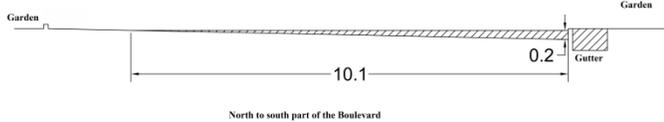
Cross-section of water current on the west band of the boulevard pavement
